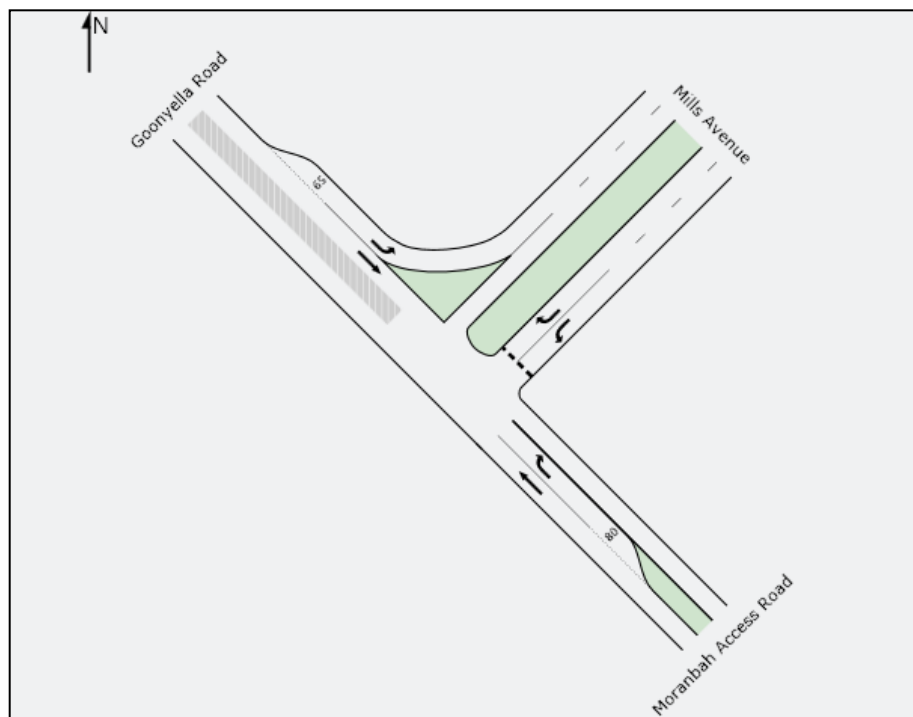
Existing Intersection Layout – Mills Ave / Moranbah Access Road / Goonyella Road
